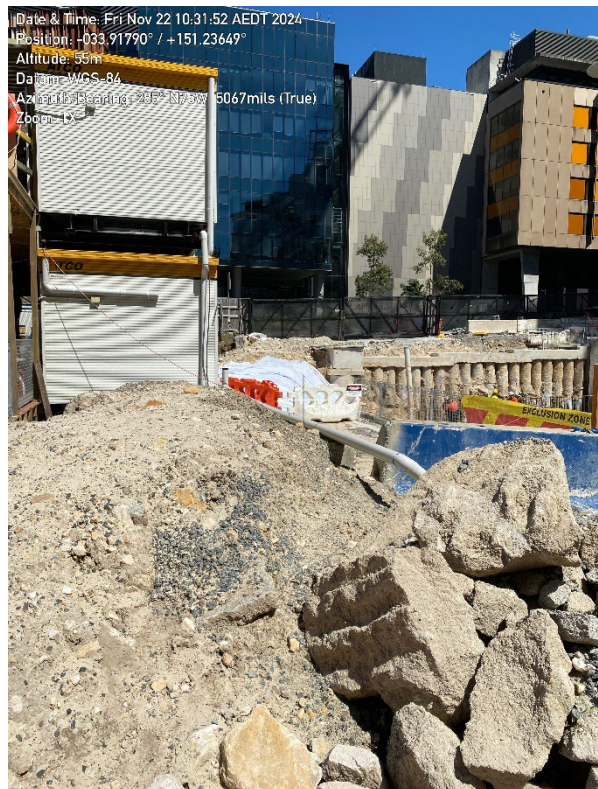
Geotextile covered stormwater drain adjacent to old site access Gate A.
